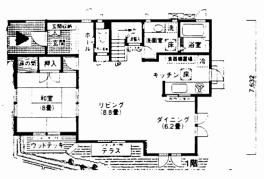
Modified Plan in Japan (Source: Tokyu Construction Ltd, 1997)
